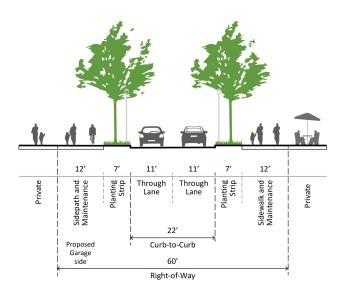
Proposed Typical Street Section for Bowman Mill Drive from Germantown Road to Walter Johnson Road
